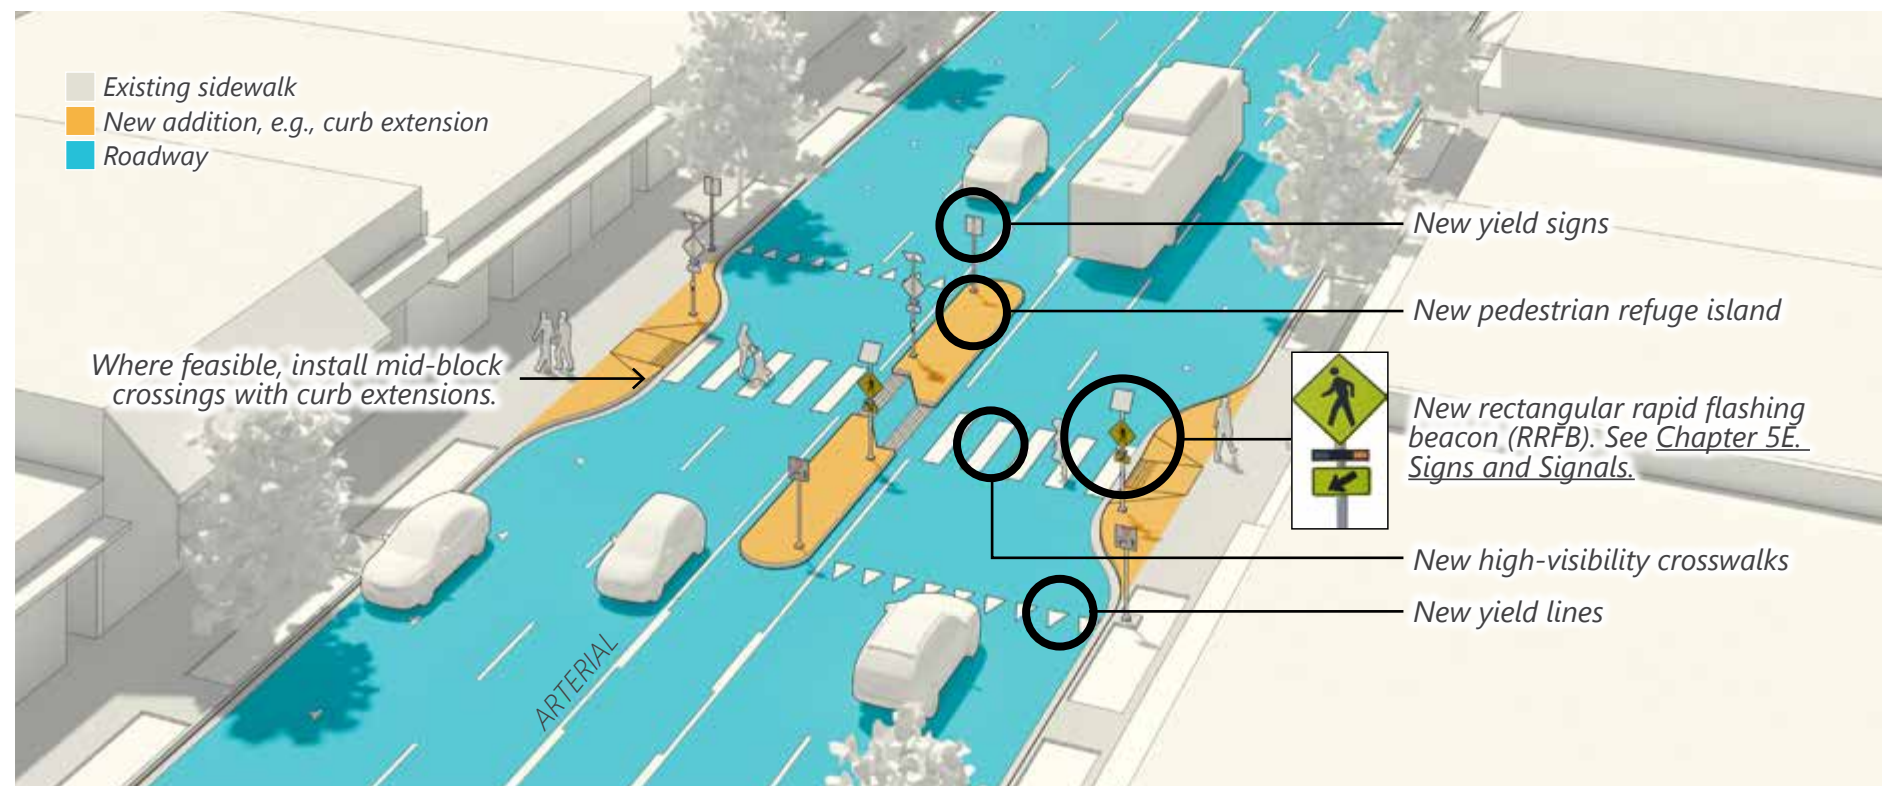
Mid-Block Crossing, Pedestrian Refuge Island, and Flashing Beacons across an Arterial Street.
